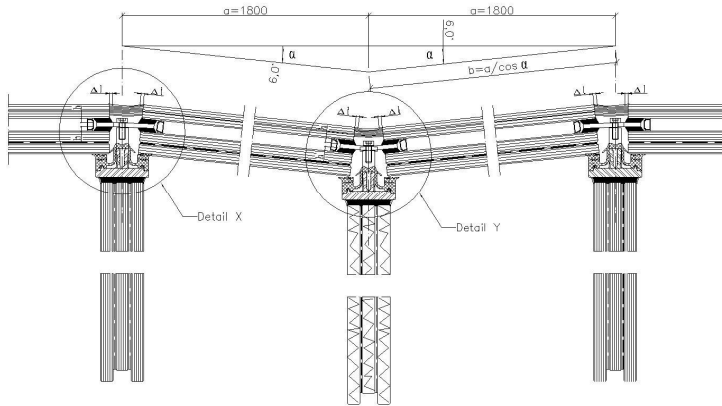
Catenary action in the roof plates if the complete glass beam section would fail.
